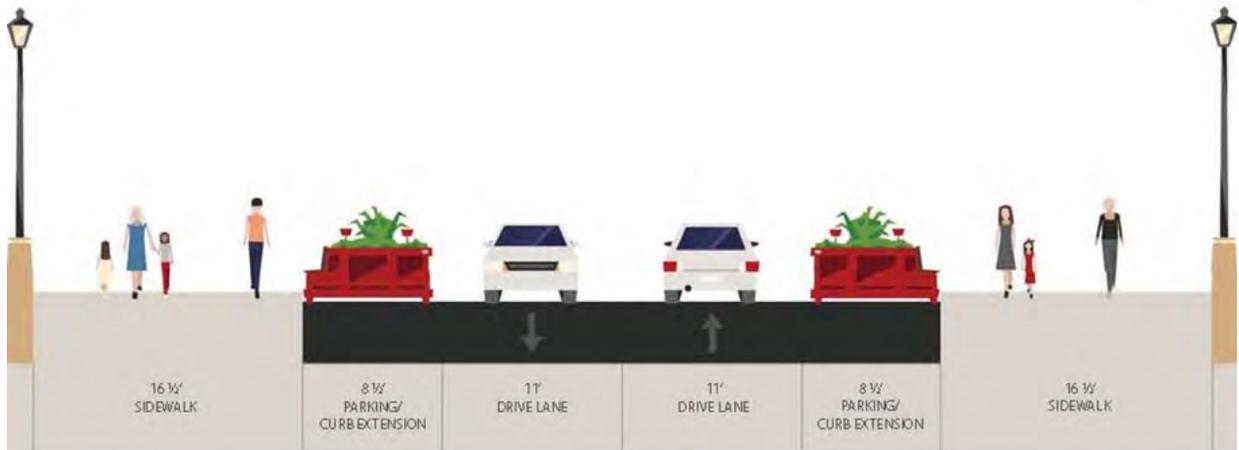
PROPOSED SECTION OF ELM STREET BRIDGE
